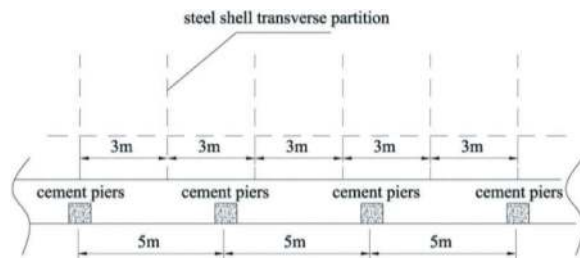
Corresponding relationship between cement piers and steel shell transverse partition (longitudinal section).
